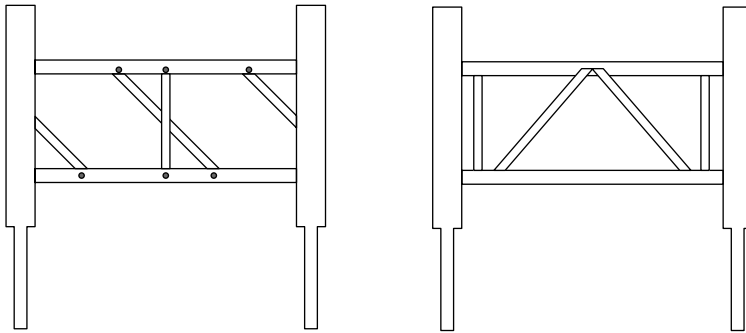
Configuration of Frame for Type 'B' Tower.
